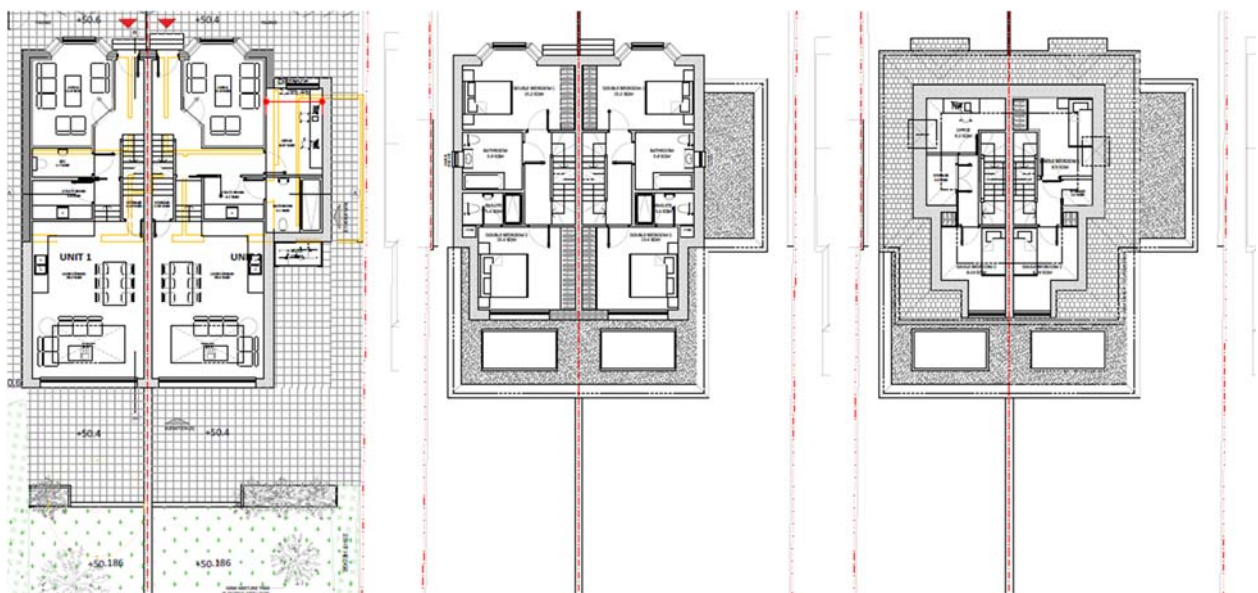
Proposed floor plan (ref:23/02472/FUL)
